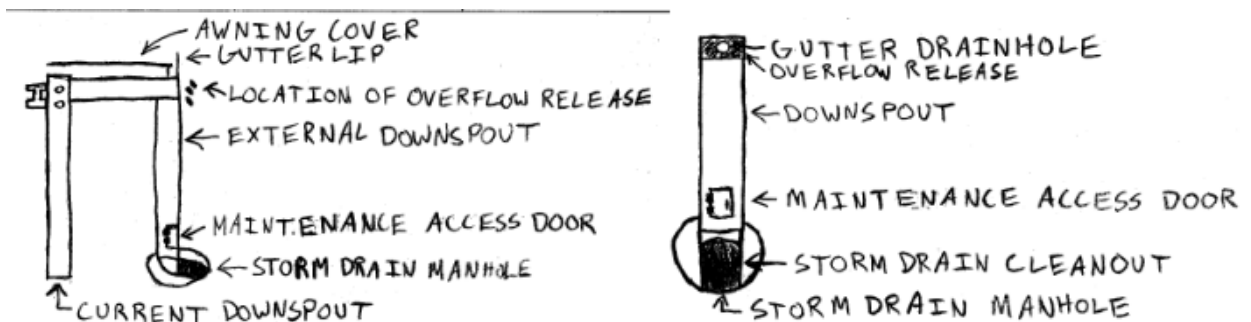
The ExoSpout design consists of an additional downspout added to the roof drainage system at Zane Middle School. The ExoSpout connects the gutter drain directly to the municipal storm drain via a manhole located at the base of the downspout. Drawing by Ahron Cervania.
